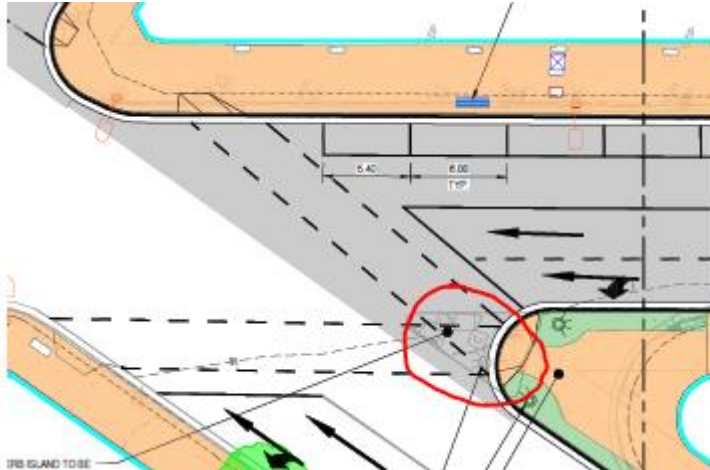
Intersecting Carrington Road south arm and Bronte Road south arm.
